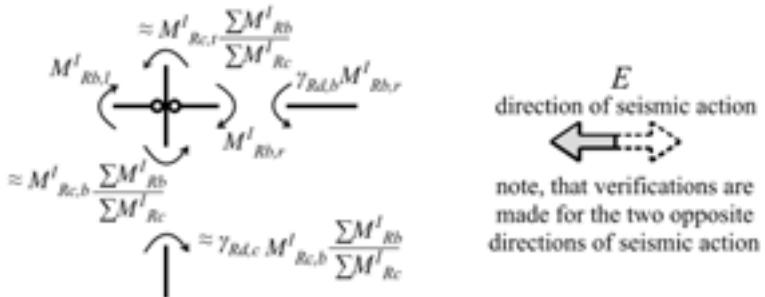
Verification of “weak beams strong columns” requirement in beam column joints
